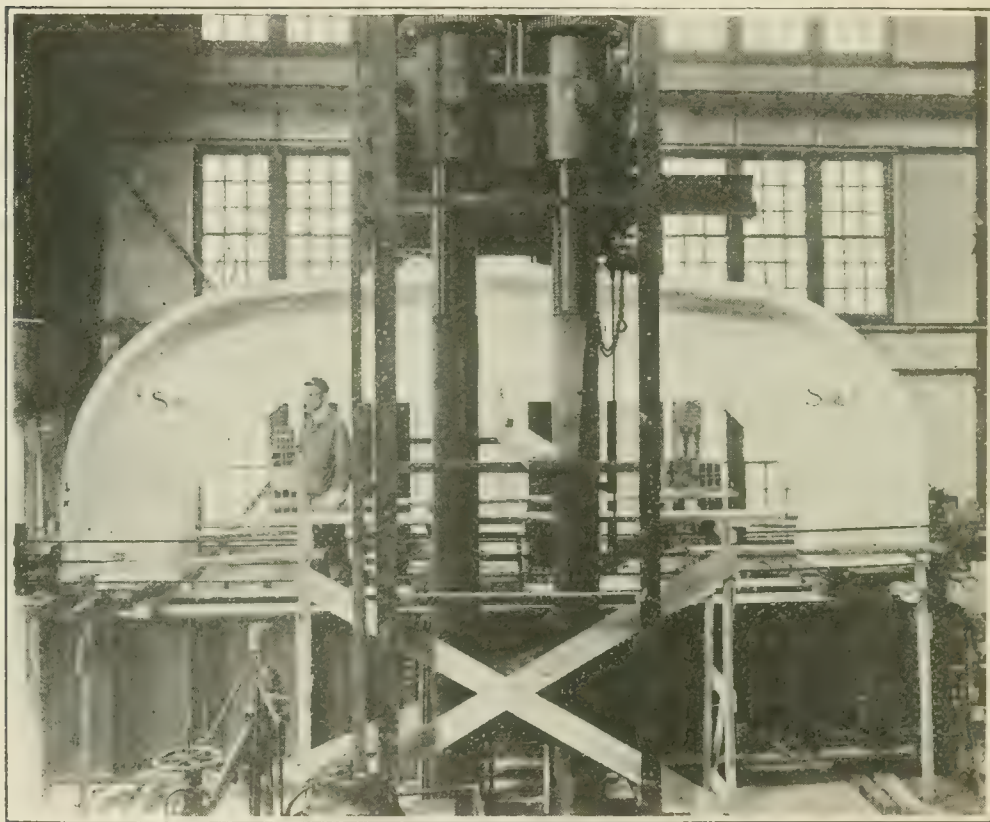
VIEW OF SHIP FRAME SPECIMENS IN 10,000,000-LB. TESTING MACHINE, BUREAU OF STANDARDS, PITTSBURGH.
